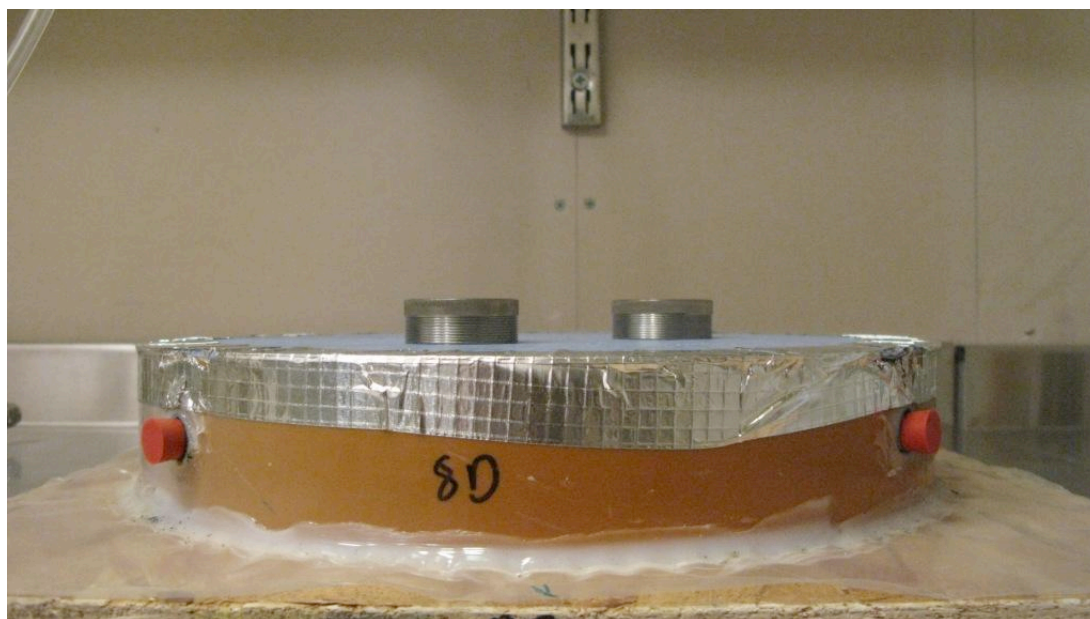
Concrete specimen with flooring and PFS cups in position. Rubber stoppers in holes for moisture measurement in the construction.
